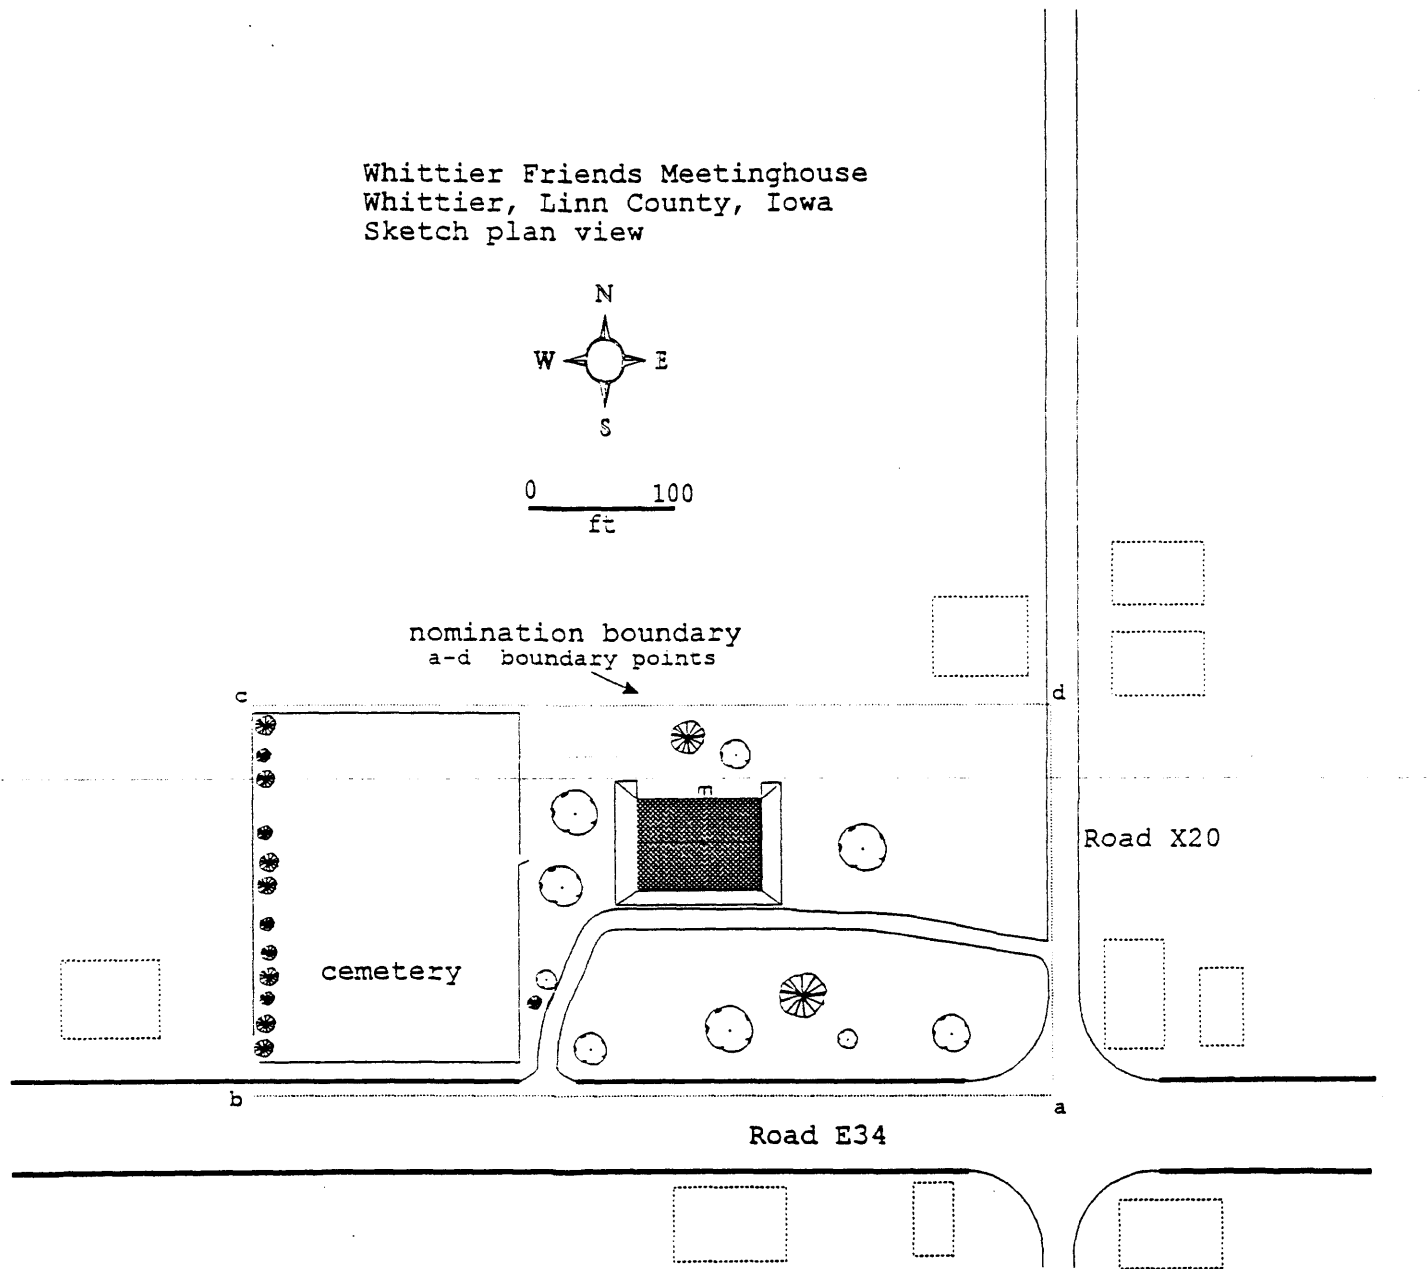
Sketch plan view of Whittier Friends meetinghouse site.
